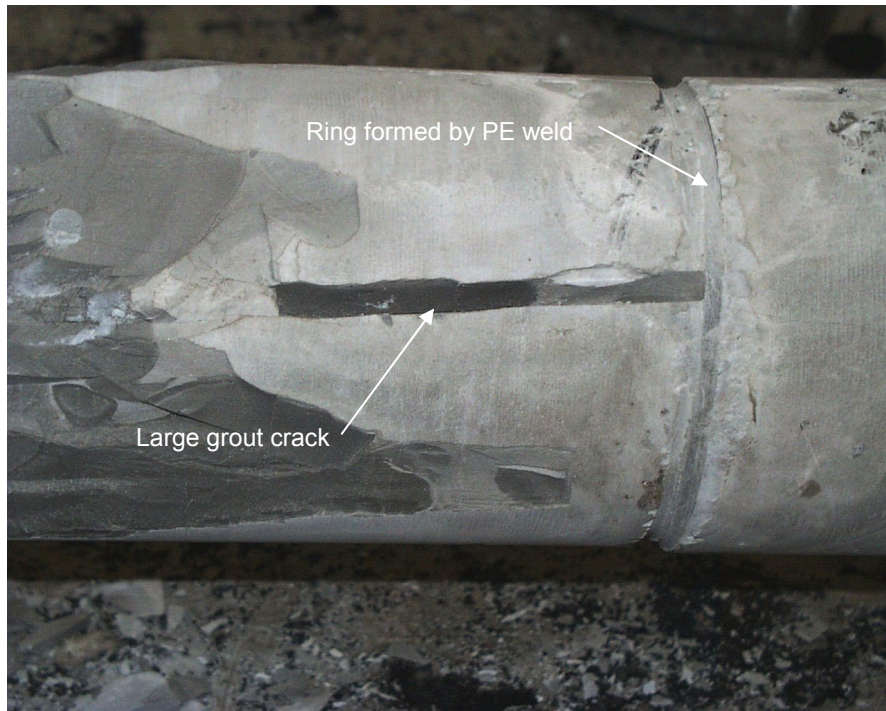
Large grout crack at deck anchorage - Specimen 6
